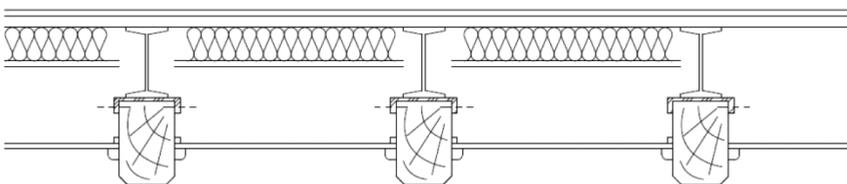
Exemplary solution of suspended reinforcement of a wooden ceiling
